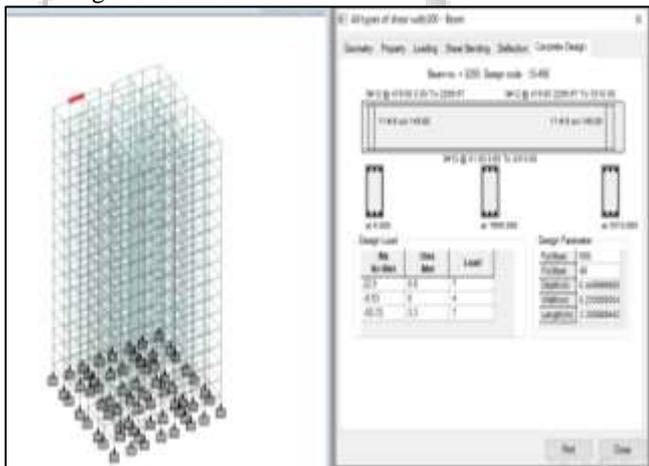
REINFORCEMENT DETAILS IN BEAM NO.3255
